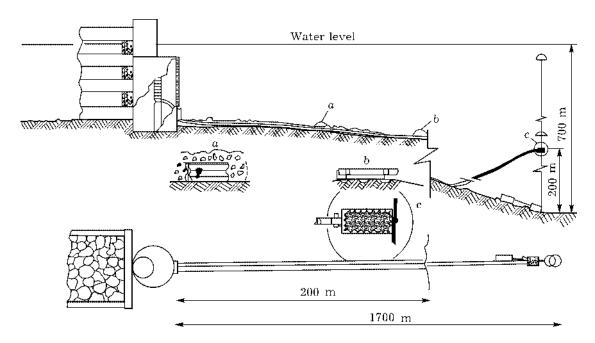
Structure of the sampling site near the settlement Listvyanka (cross-section of the pipeline and view from above): a – a shallow site at the depth of 0–20 m; b – a deep site (over 20 m), water conduit in assembly with the fixing rope; c – water conduit head, filter for rough purification with mesh size of 0.35 mm.
